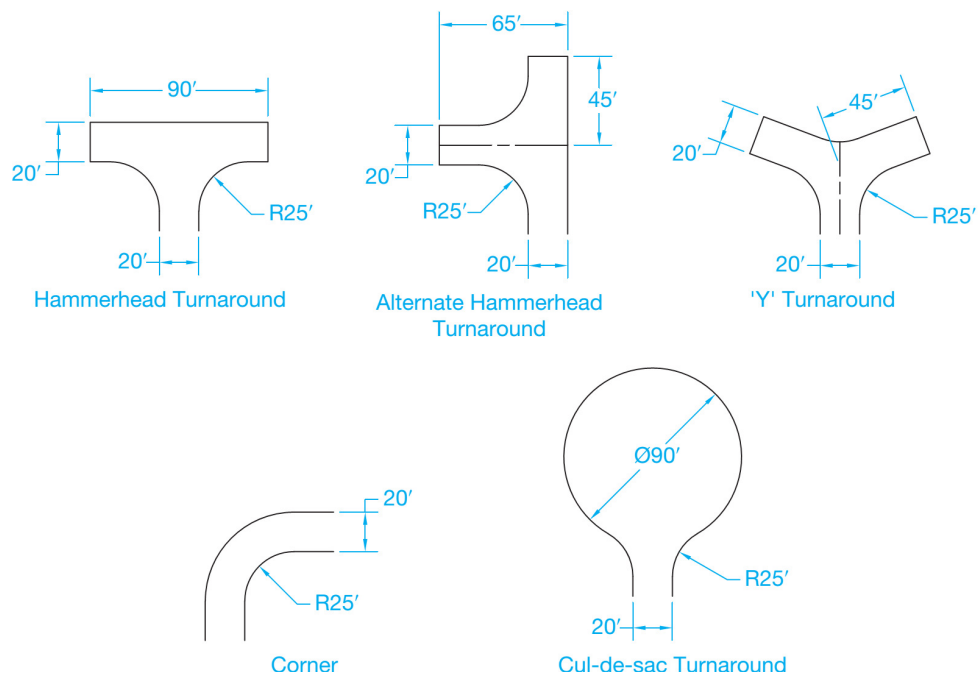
Several basic driveway design options for rural residential fire department access.
